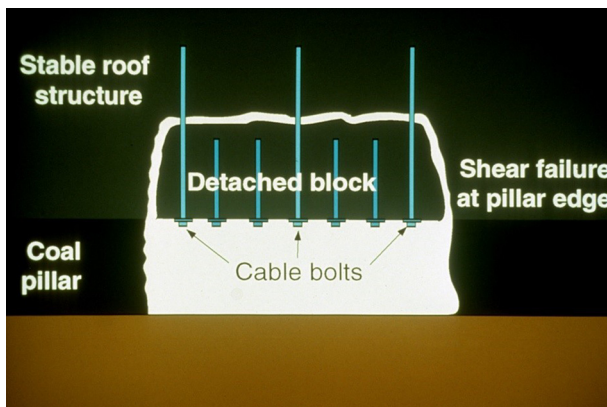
Detached block of a failed roof supported by cable bolts.
